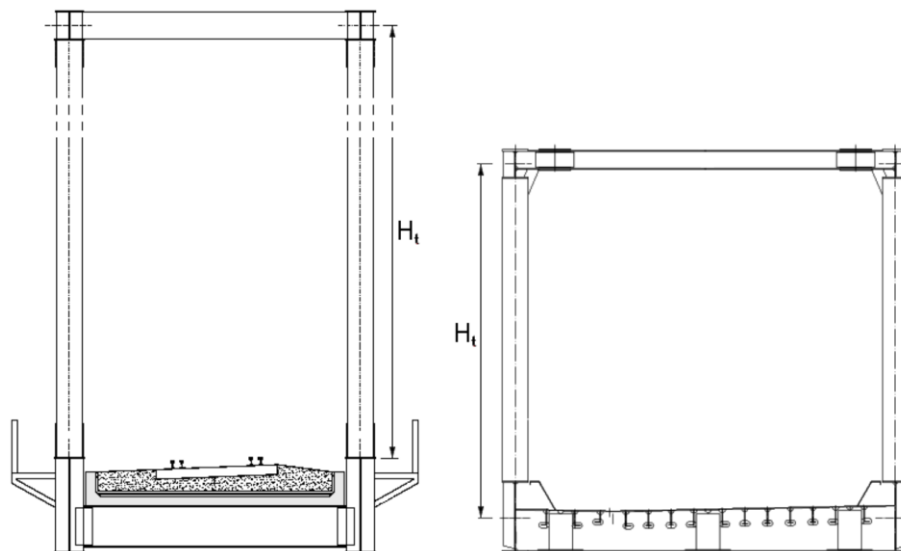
Bridge span cross-sections: the Span-51 and the Span 93 on the left, the Span-38 on the right
